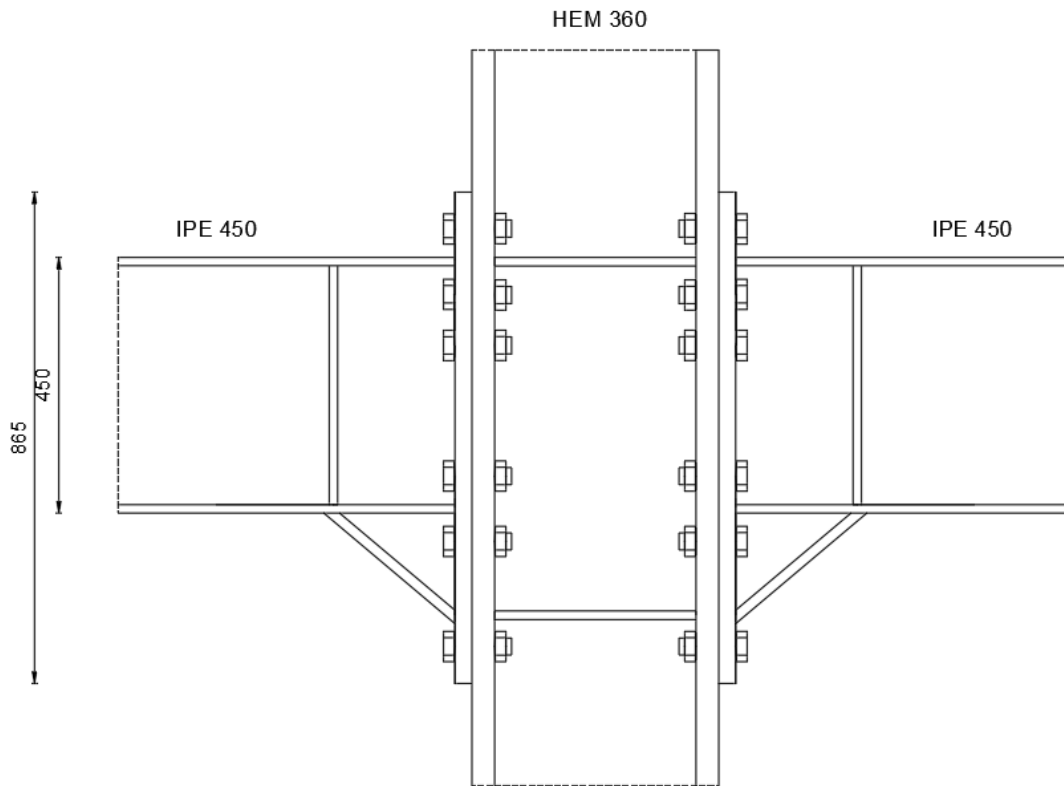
Double-side joint configuration of haunched connection of beam IPE 450
